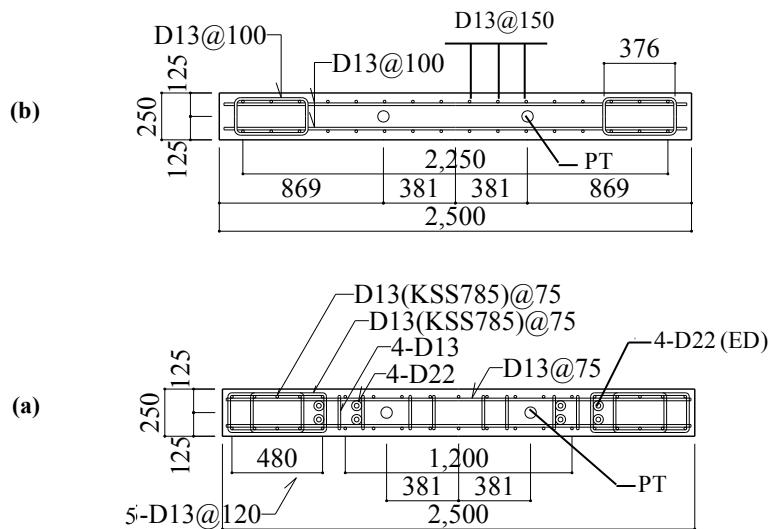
UPT wall cross sections of (a) 1st story and (b) upper wall panels (dimensions in mm)
